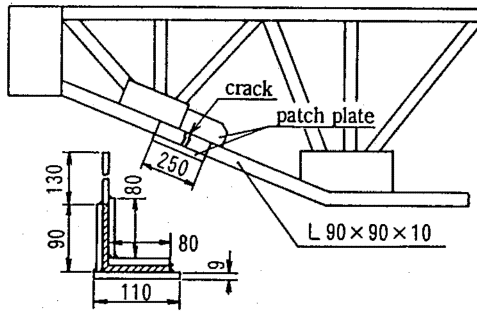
Crack at the auxiliary girder and repair with patch plate.
